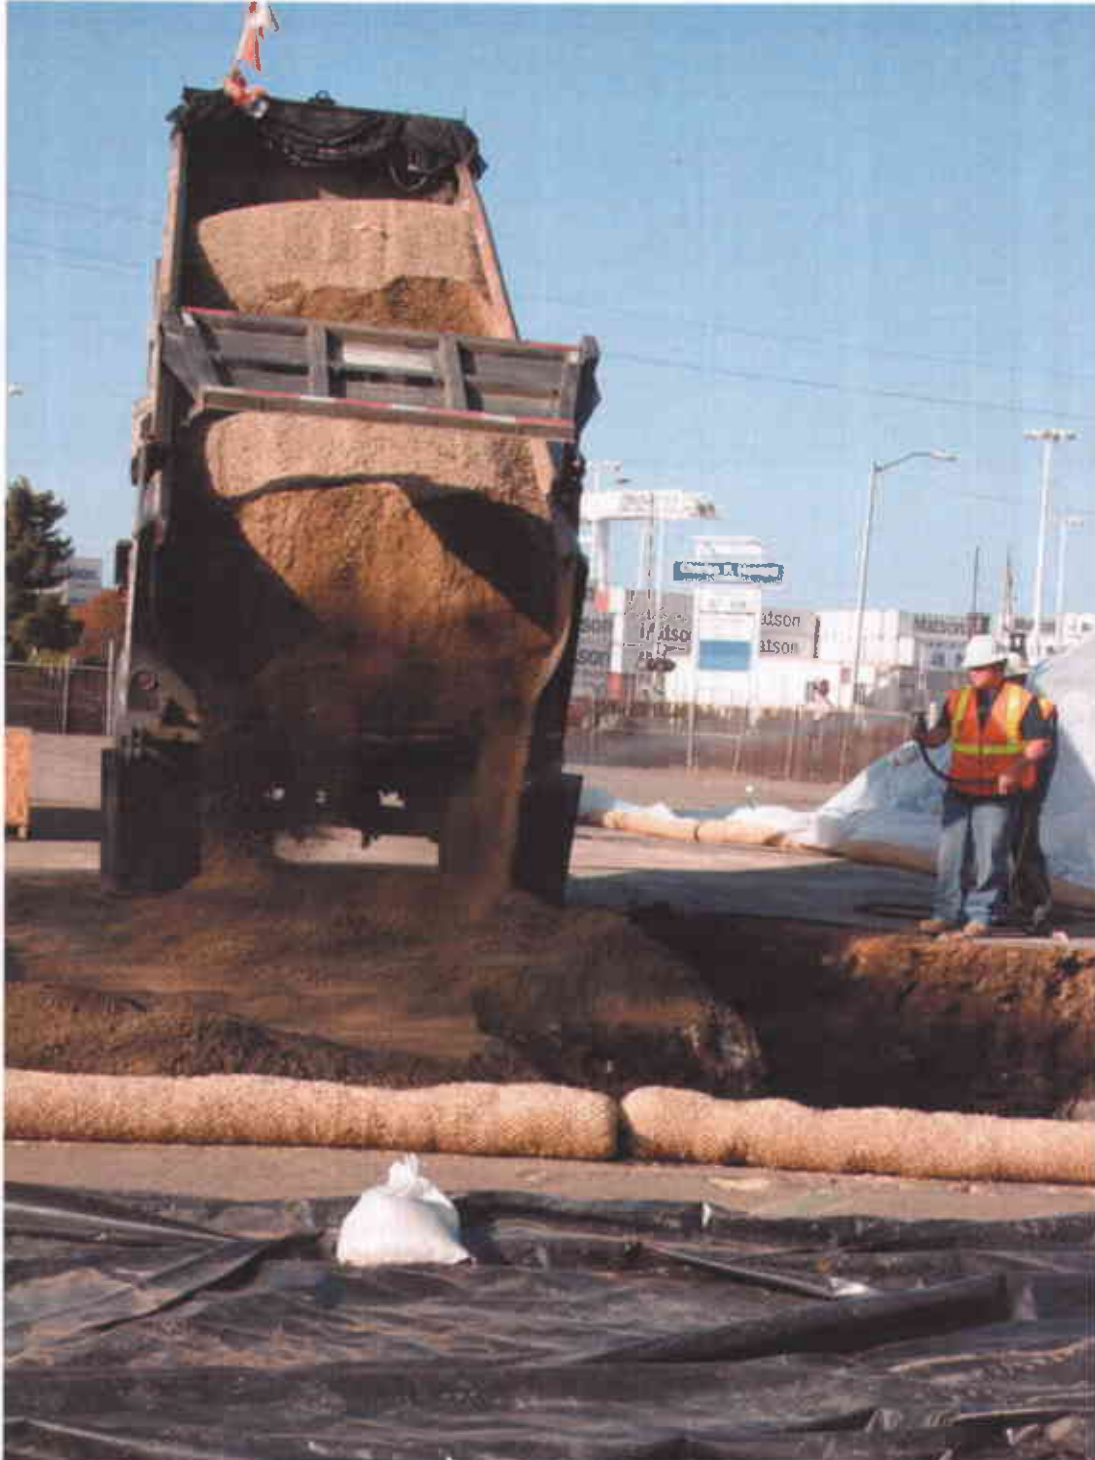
Backfilling operations: the second load of backfill material being emptied into the excavation at the location of concrete foundation (Note the water being sprayed to impart moisture for compaction; 4/26/2007)
